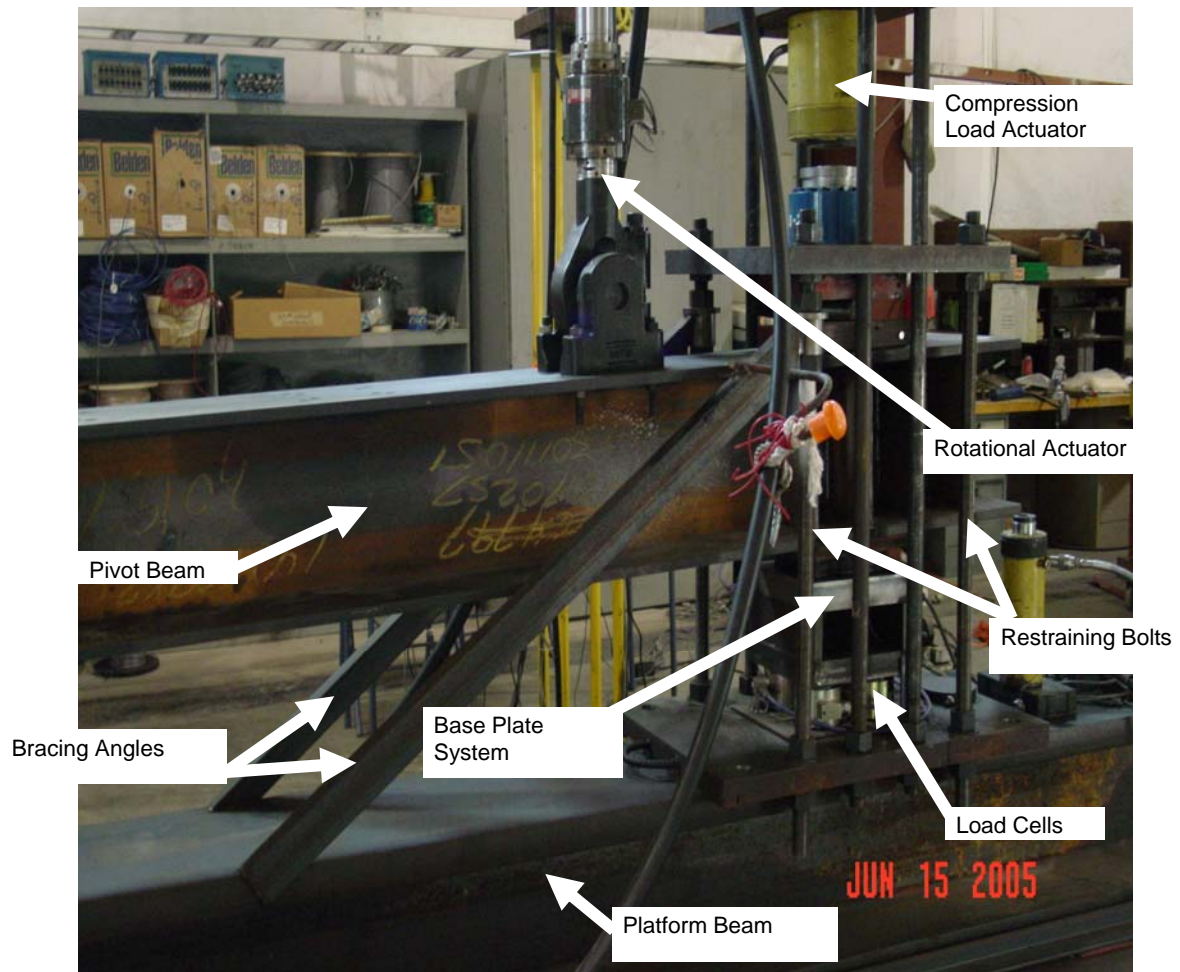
View 2 of the Combined Loading Testing Assembly
